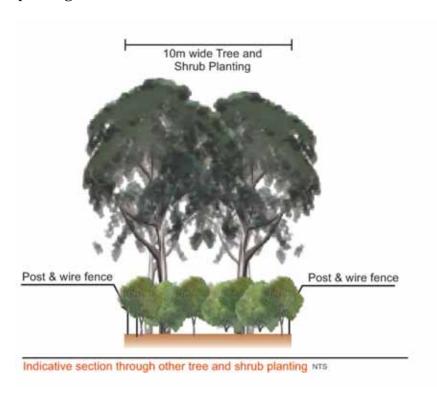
Indicative Section Through 10m Strip of Tree Planting
